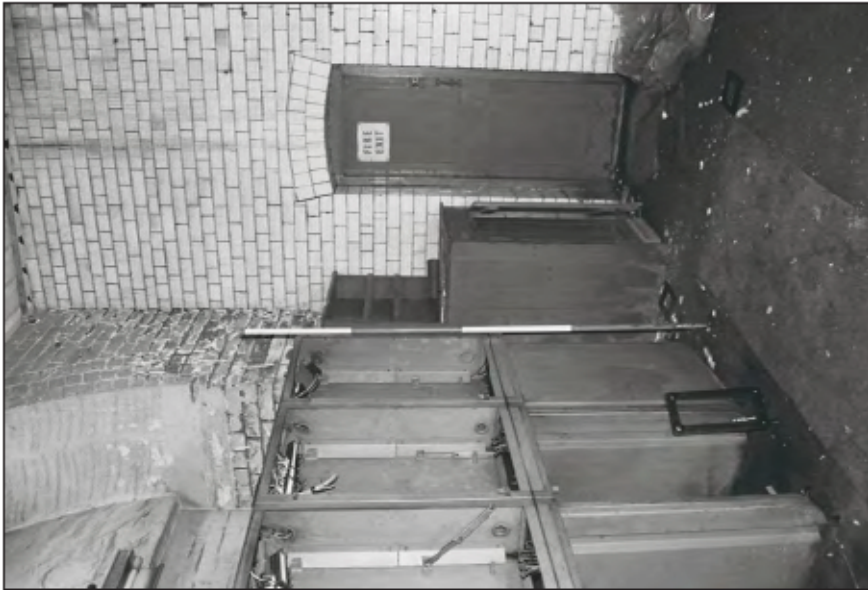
General view of substation room in northern end of cableway within eastern aisle of Building 10. (film 26.08)
